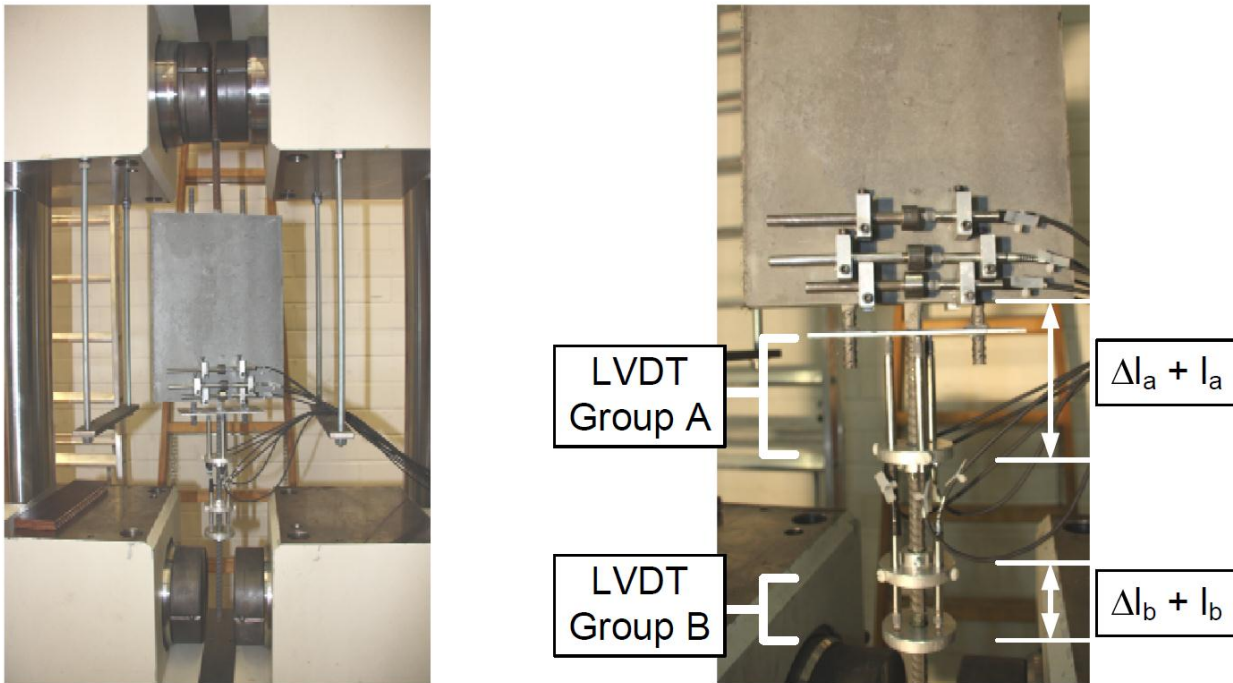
Specimen in testing machine (left), LVDT's arrangement (right).
